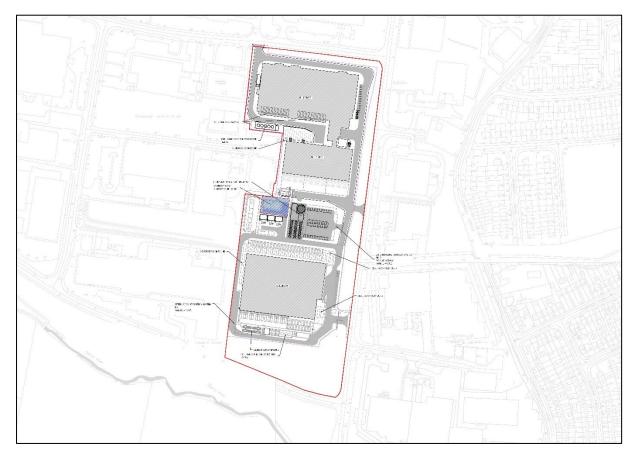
Site Location (21_123F-CSE-00-XX-DR-C-0002 - Overall Site Plan)
